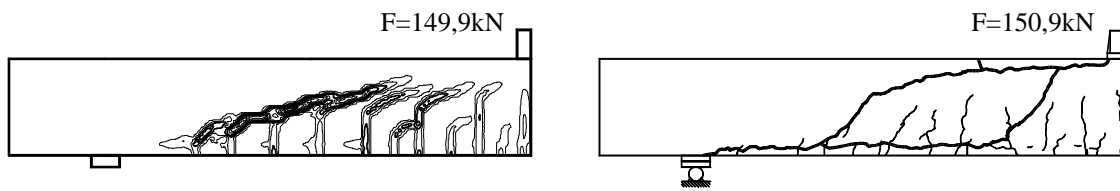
Crack propagation at failure of test beam 1L1 from Non-FEM and test
